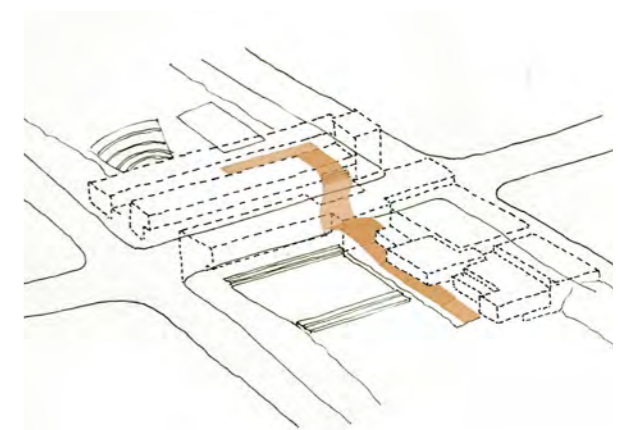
The continuous surface of hard landscaping from the field, through the building, across the street and into the area to the north of the residential buildings.
